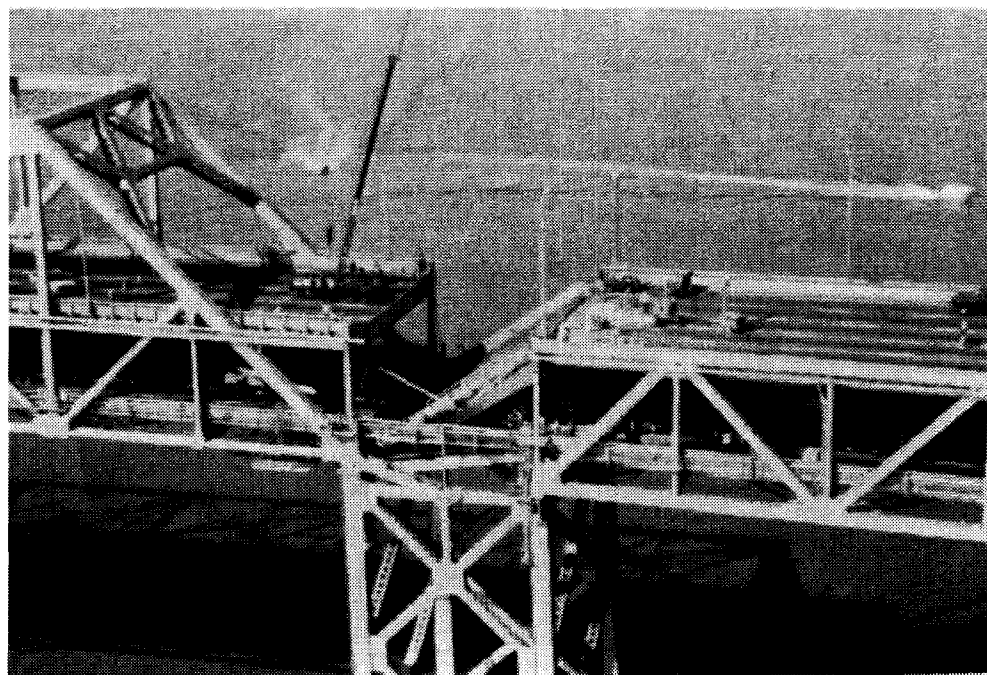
Aerial photo looking north at pier E-9 on October 19, 1989, showing the collapsed upper and lower 15.1 m deck spans.
